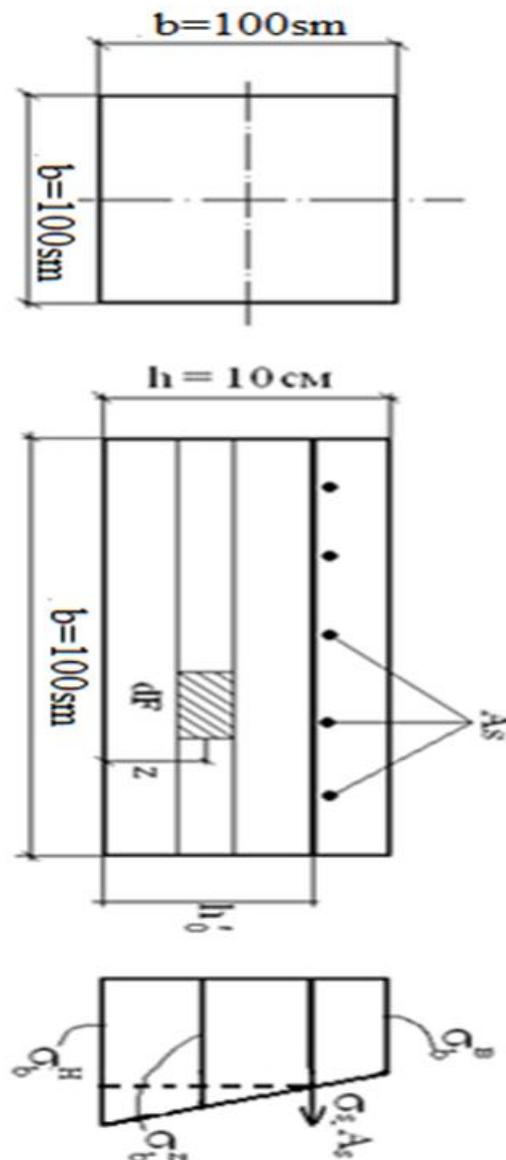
Schemes for calculating a slab of a bridge canvas made of reinforced self-stressed concrete
